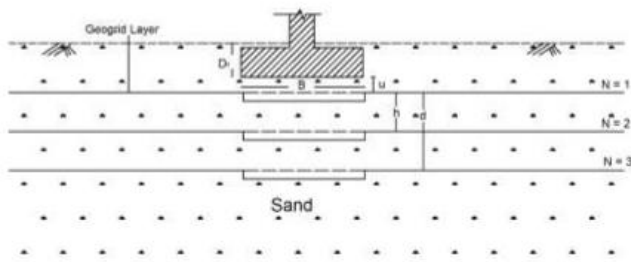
Geo-synthetics reinforced soil foundation system.
